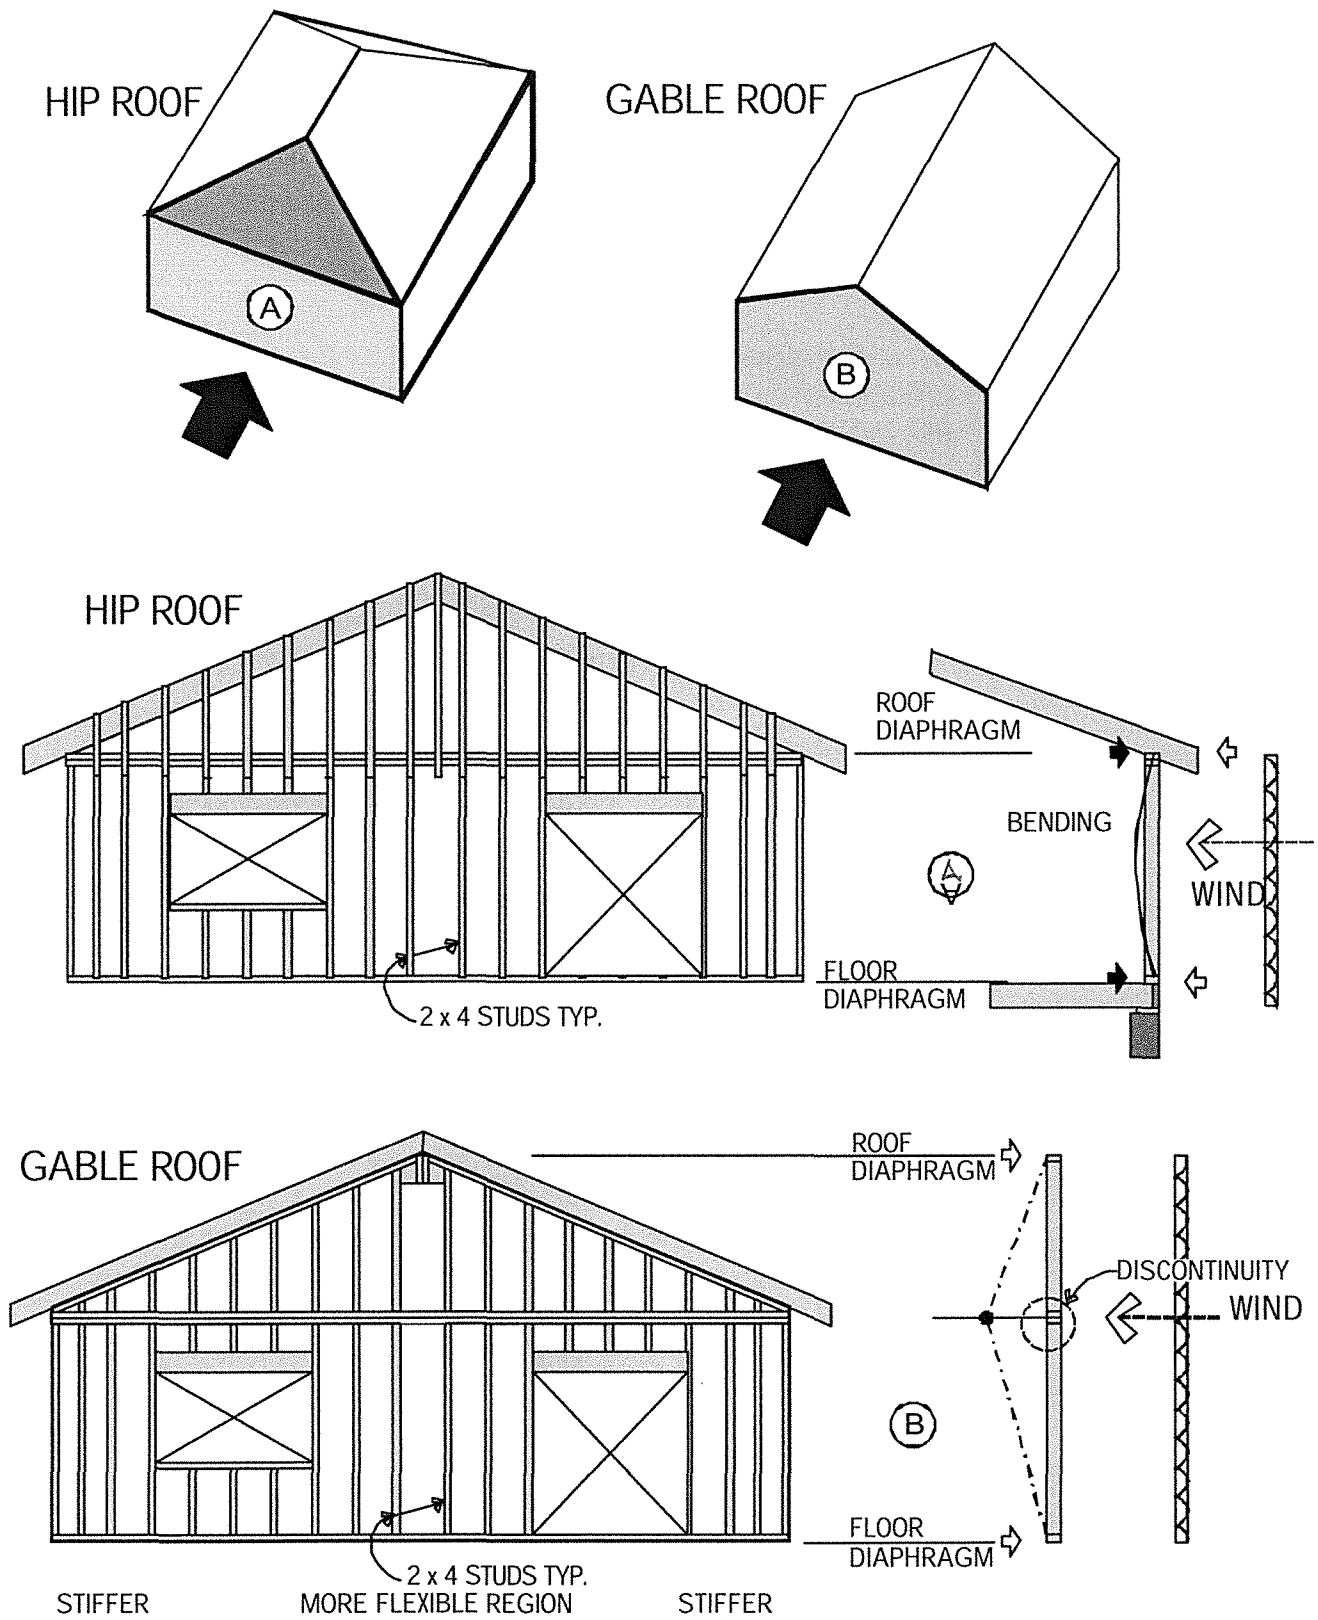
Stability-Wind on Gable and Hip Roof End Walls
